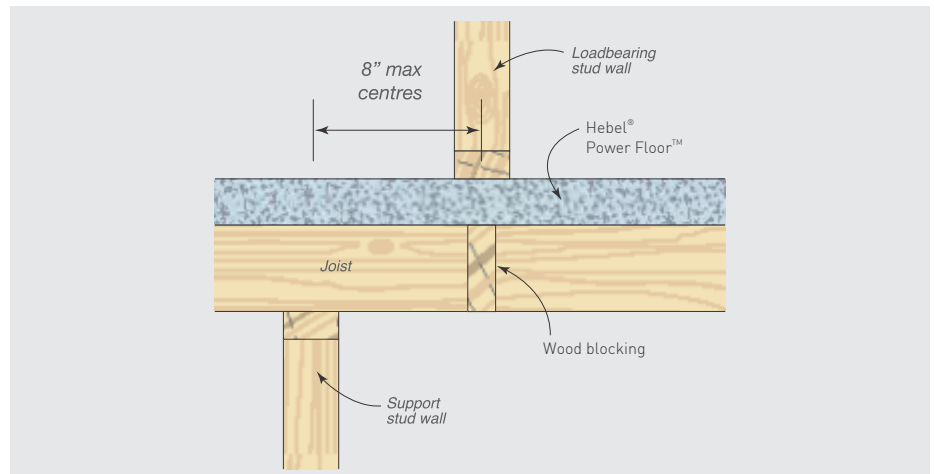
Platform Flooring with Internal Loadbearing Wall.
